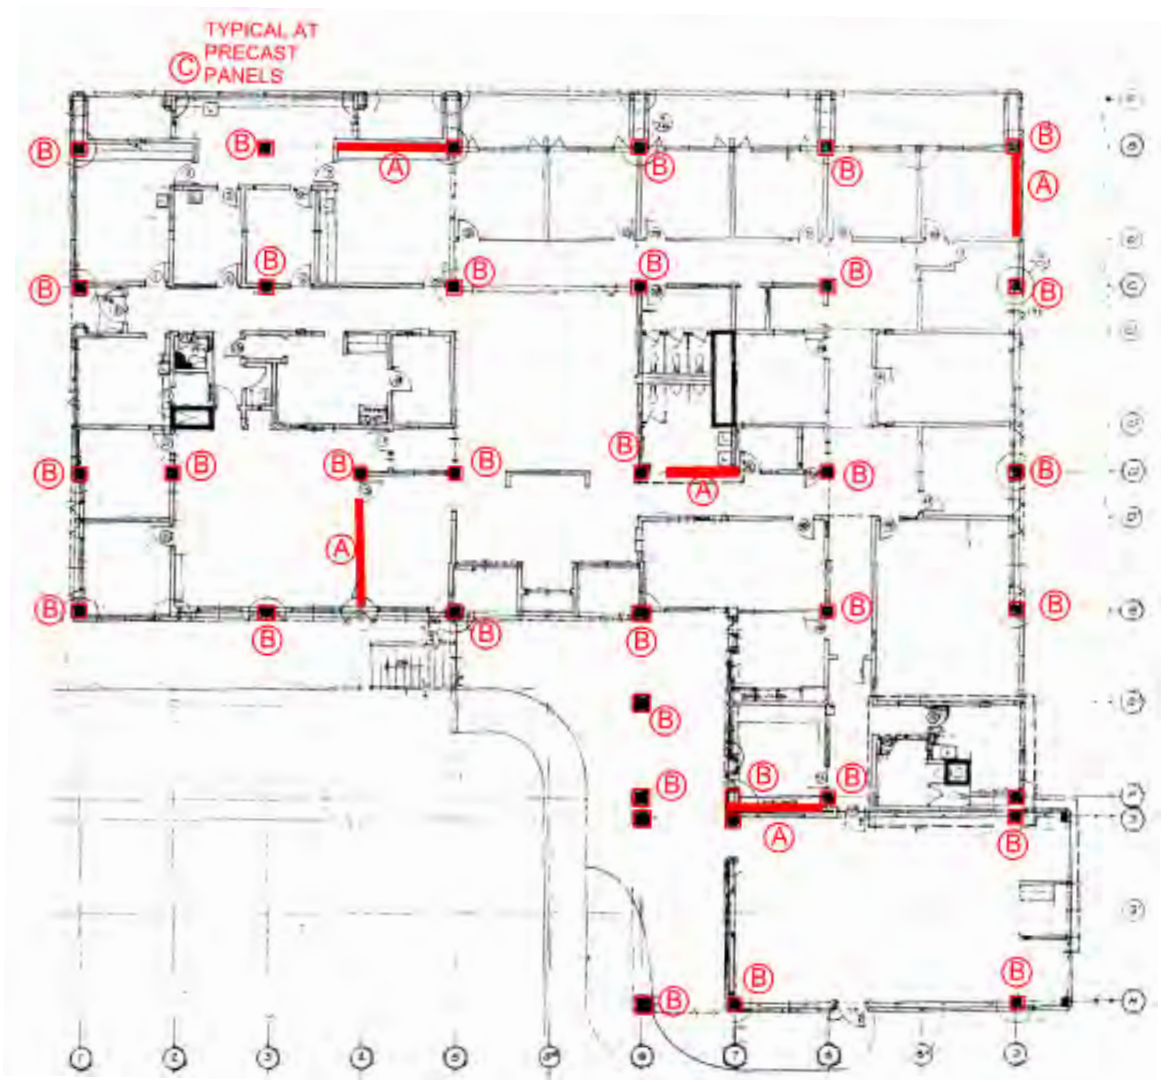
Typical floor plan at Annex indicating: A=proposed locations of retrofitted shear walls; B=concrete columns; C= exterior precast concrete façade panels
